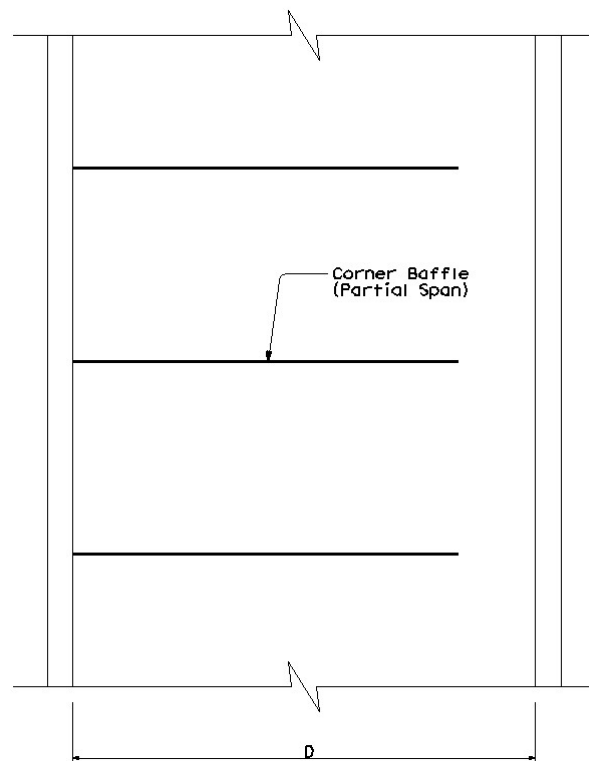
Corner Baffle (Partial Spanning) Plan View
